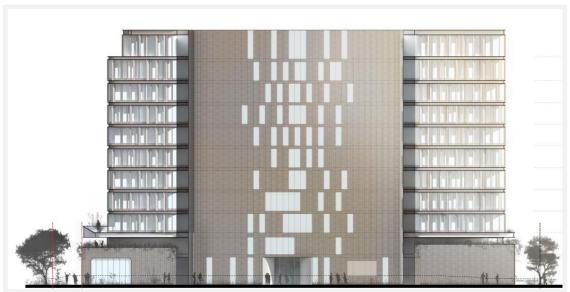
Rear façade of proposed Building A, to face new Road 01 (Source: 3XN)
